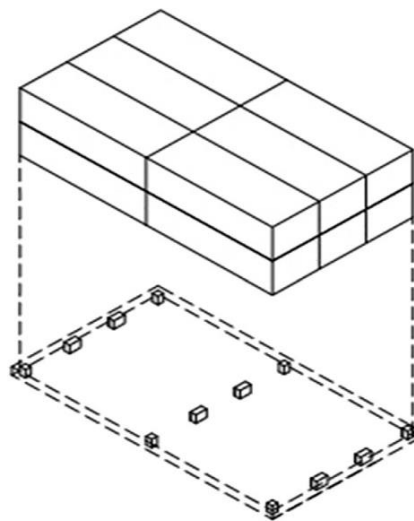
Modules' foundation design in residential construction by Salama et al., (Salama et al., 2017)
